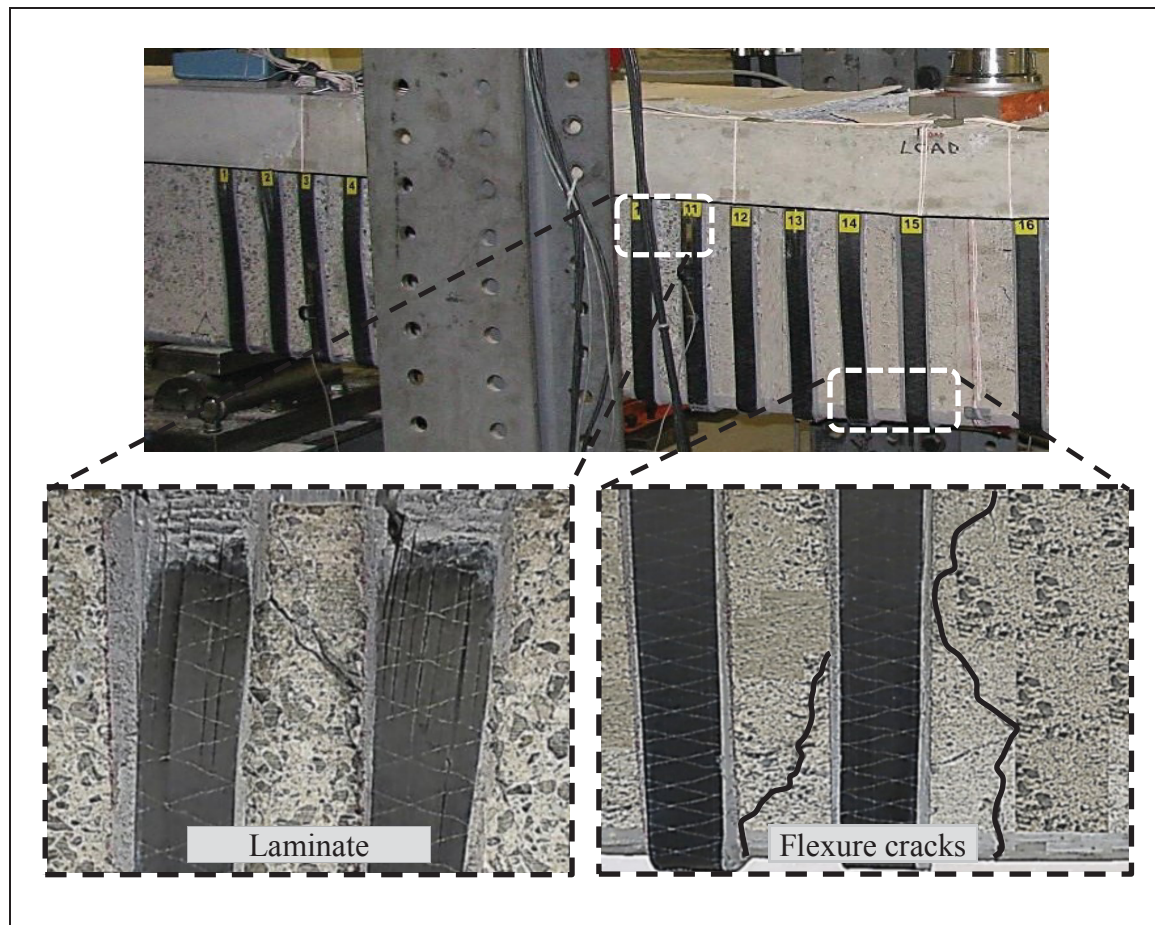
Failure mode of specimens with CFRP anchored laminate
